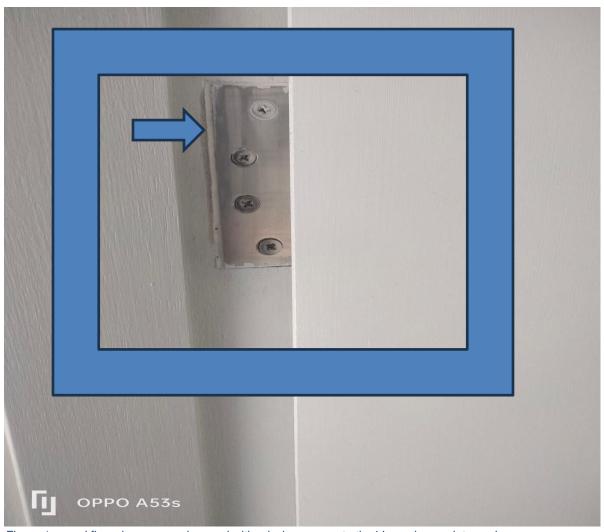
ground floor doors were observed with missing screws to the hinges incomplete work.
